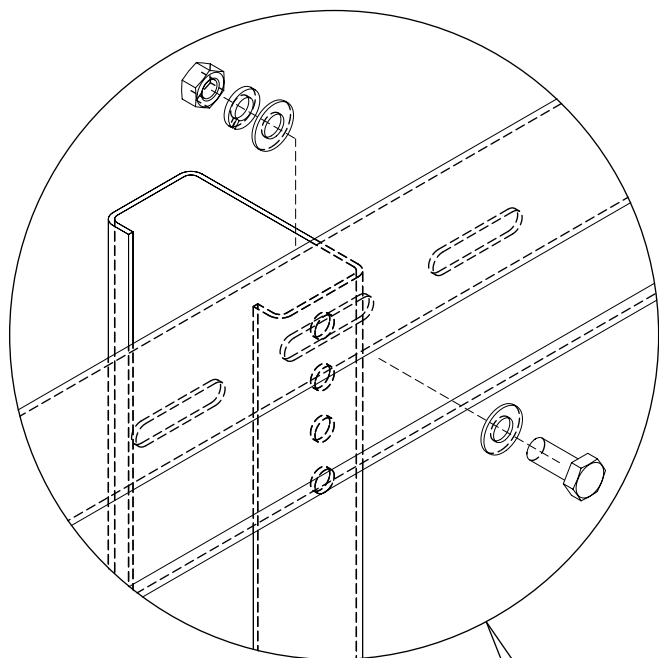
Attaching the supporting channel to the pole with the use of G.1 VNZ bolt set
